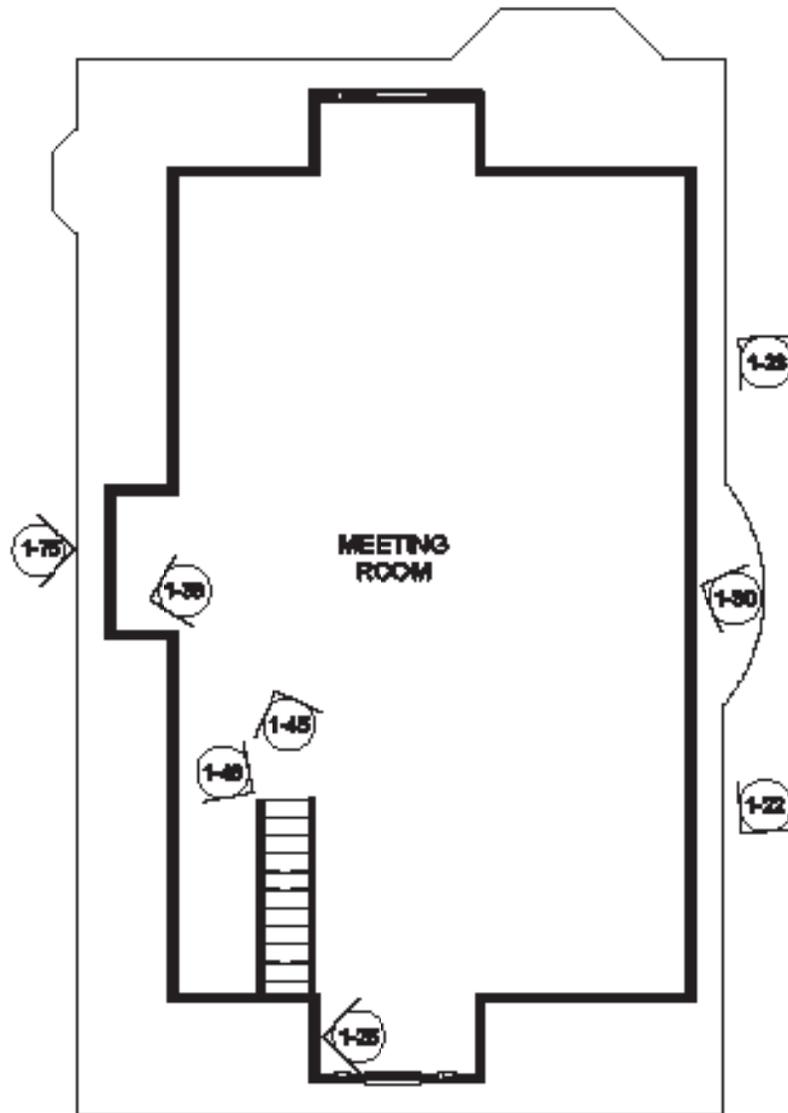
Attic Floor Plan, 2020 (source: Ratio)
